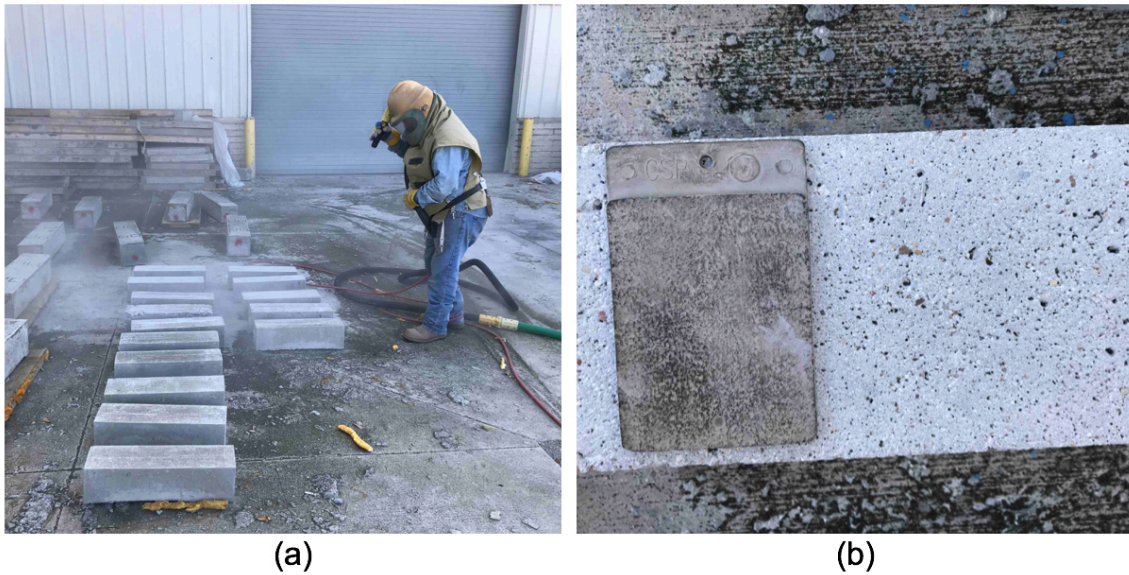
Sandblasting: (a) The technician sandblasts the top surface of the concrete beams, (b) top concrete beam of (CSP 3) with corresponding to ICRI
